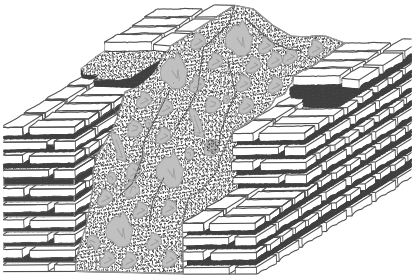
Walls in earthen rammed with brick facings (Naima Mahindad, 2016)
